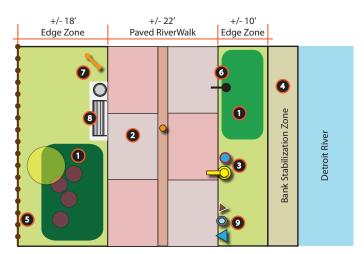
Riverfront Extension Plan-Section: Full Level of Development
